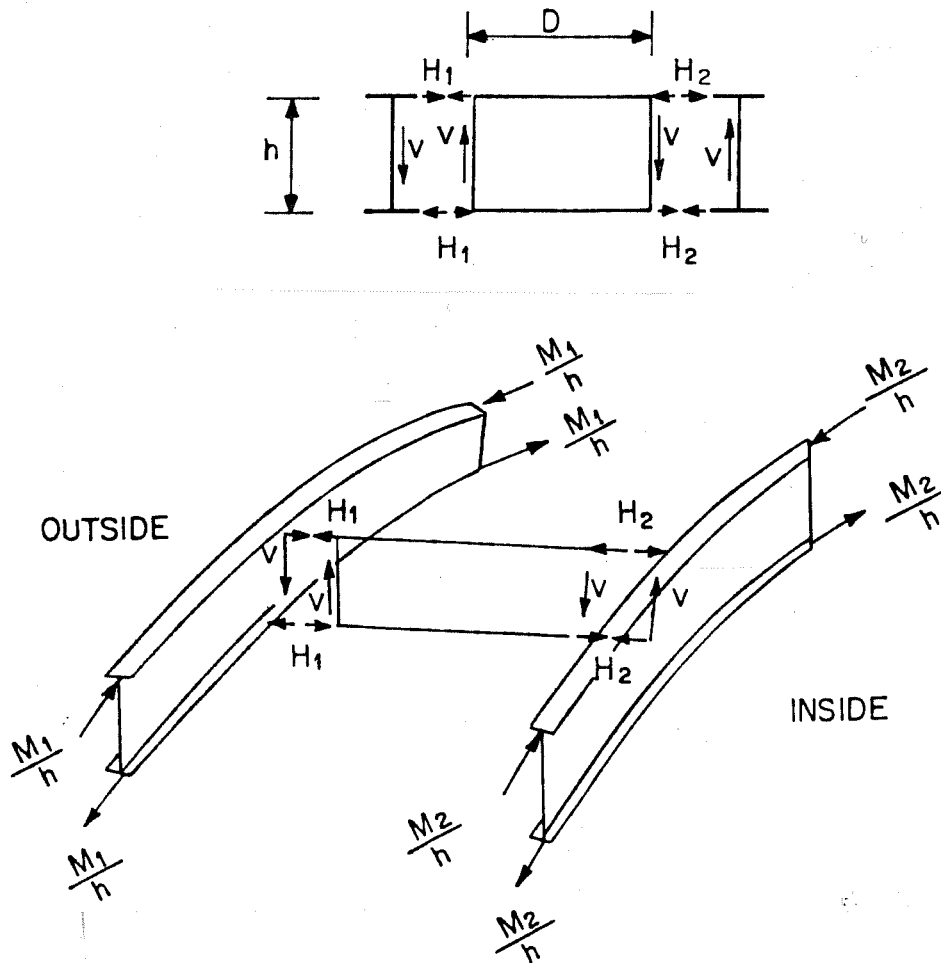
Cross section of bridge showing diaphragm and girders.
